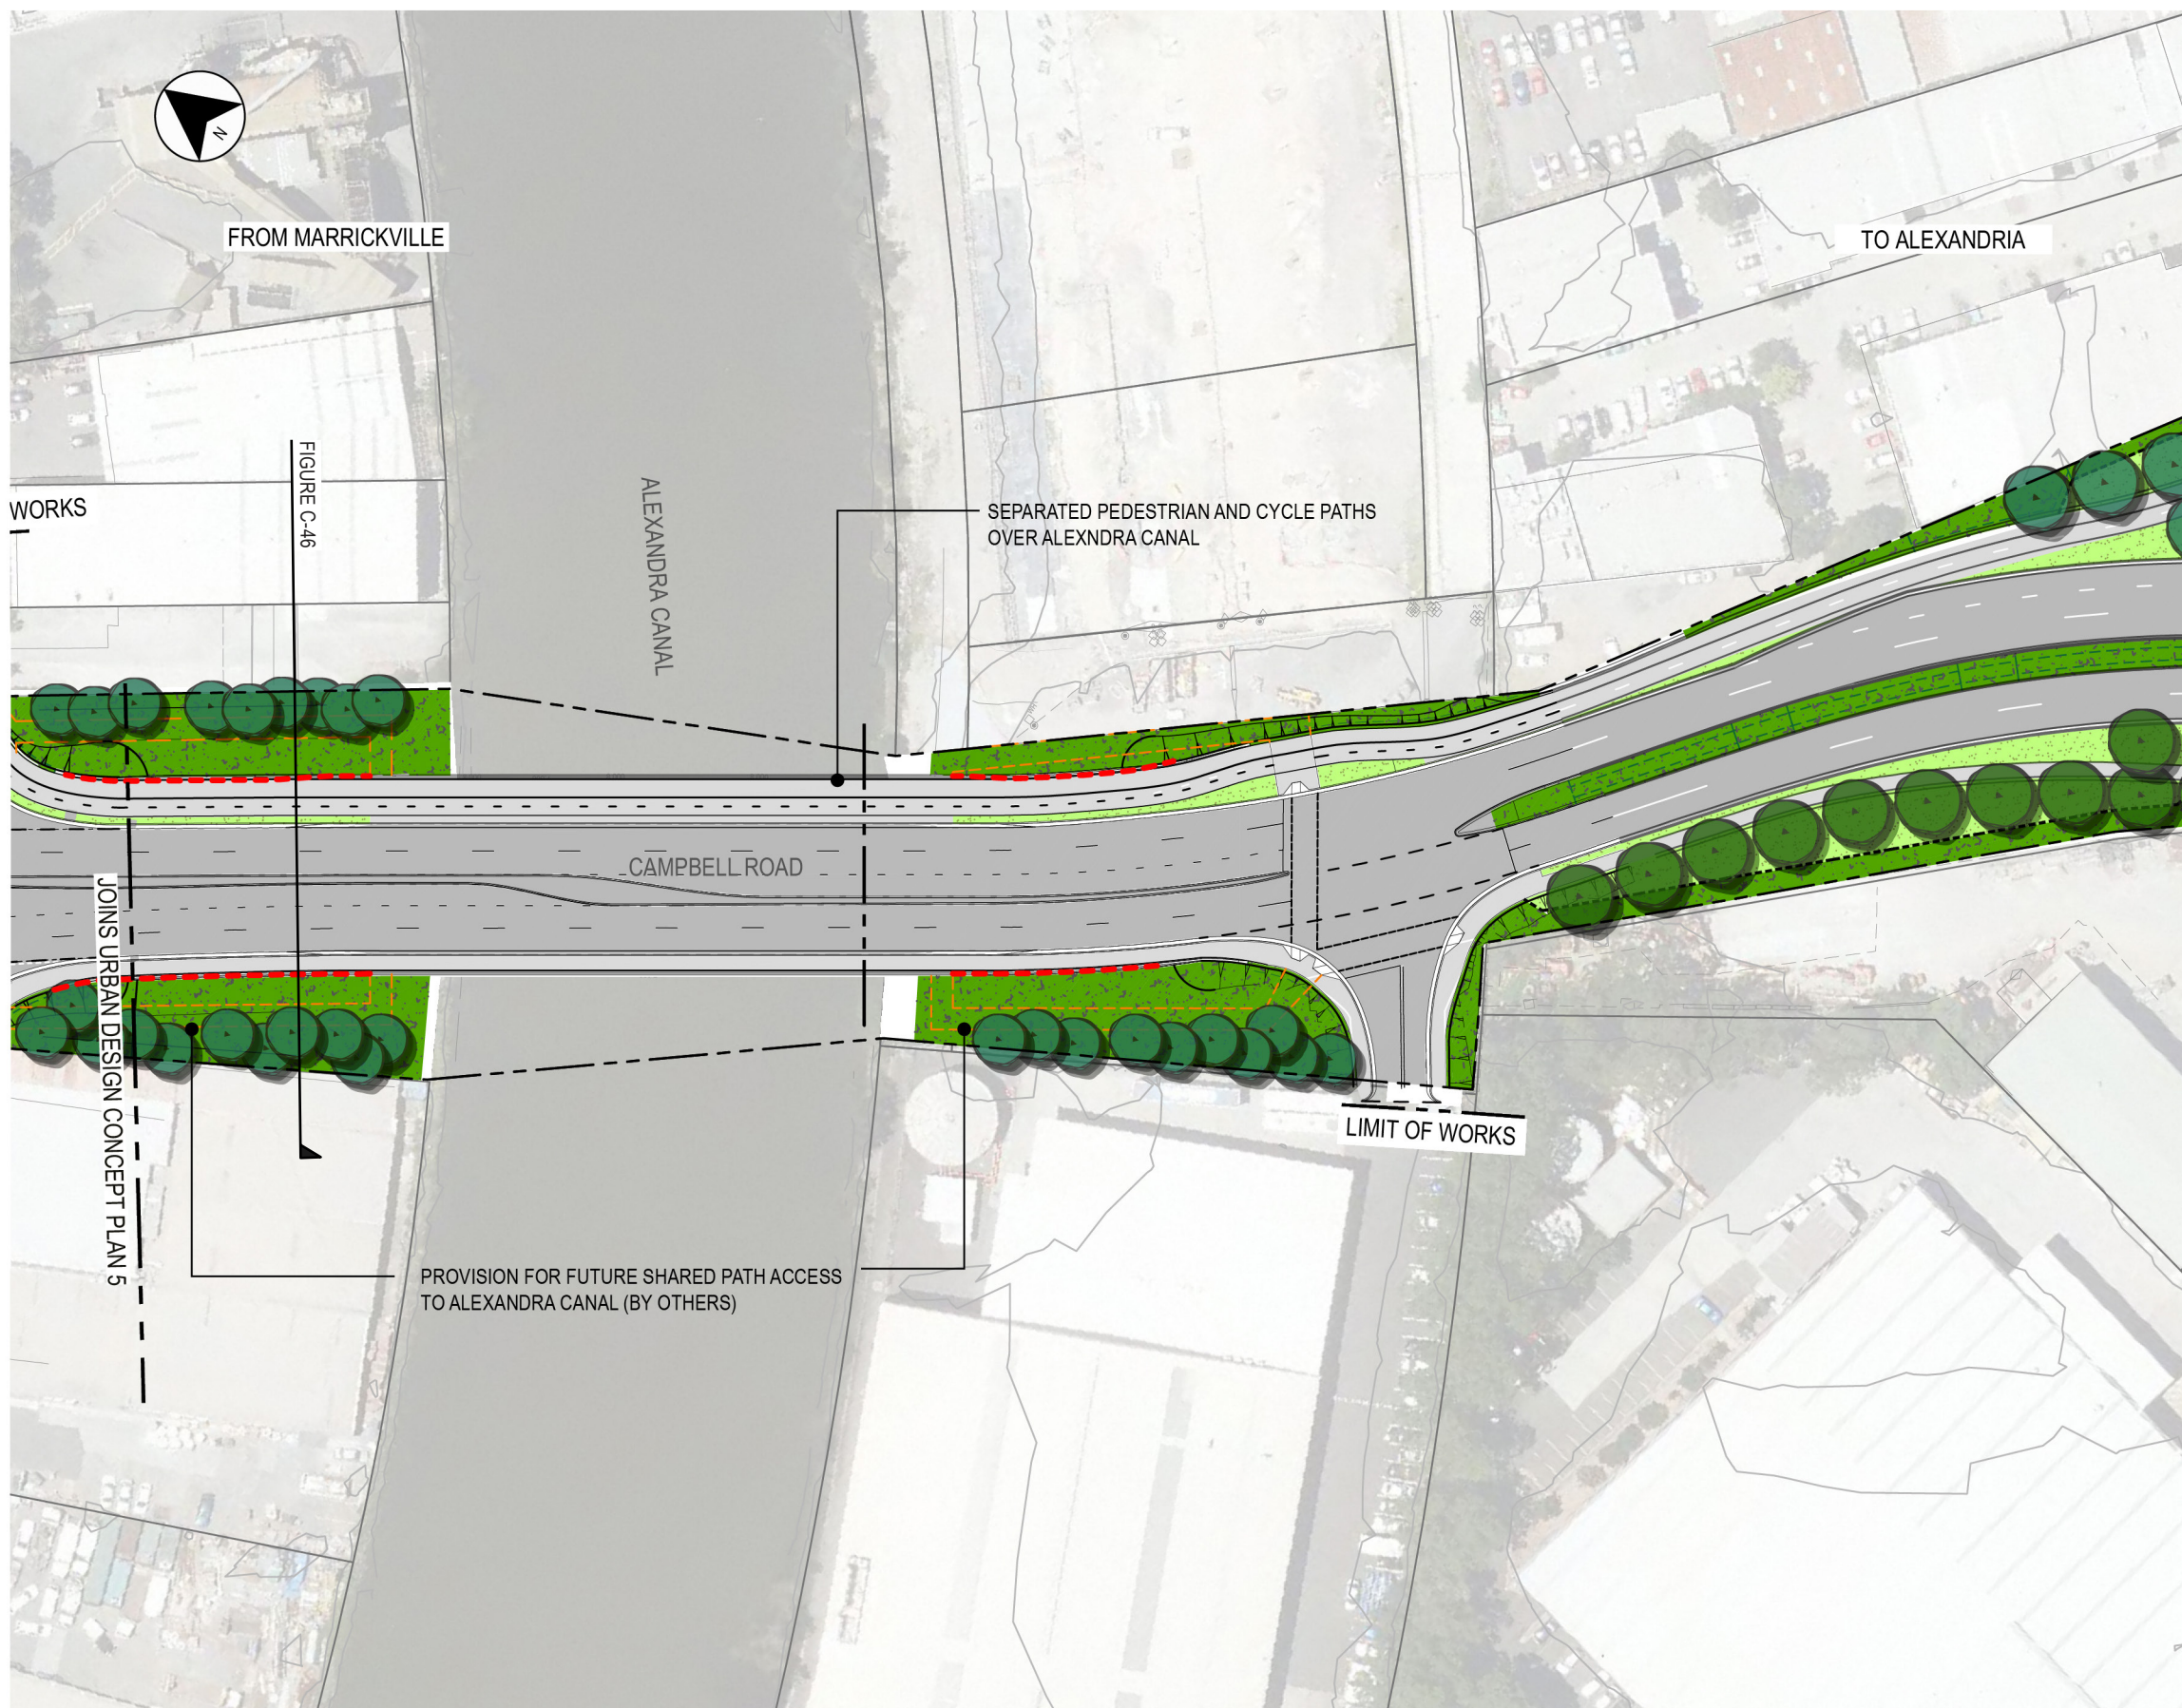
Campbell Street Green Link - Urban Design Concept Plan - Campbell Street / Campbell Road - Sheet 4 of 6 - 1:1000
